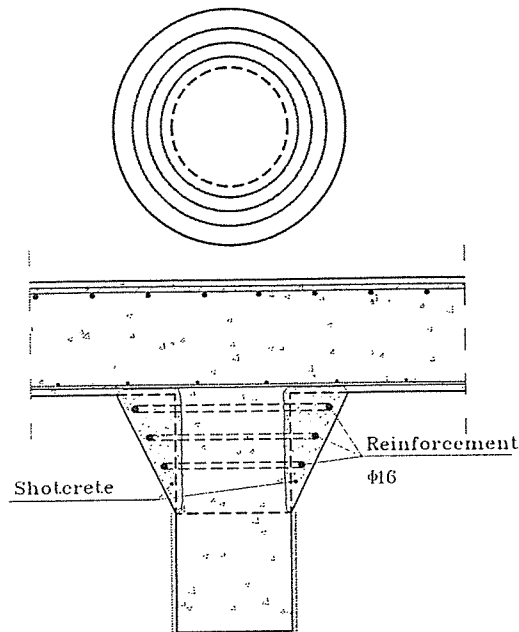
Test slab SSK4.k with a new shotcreted column head.
